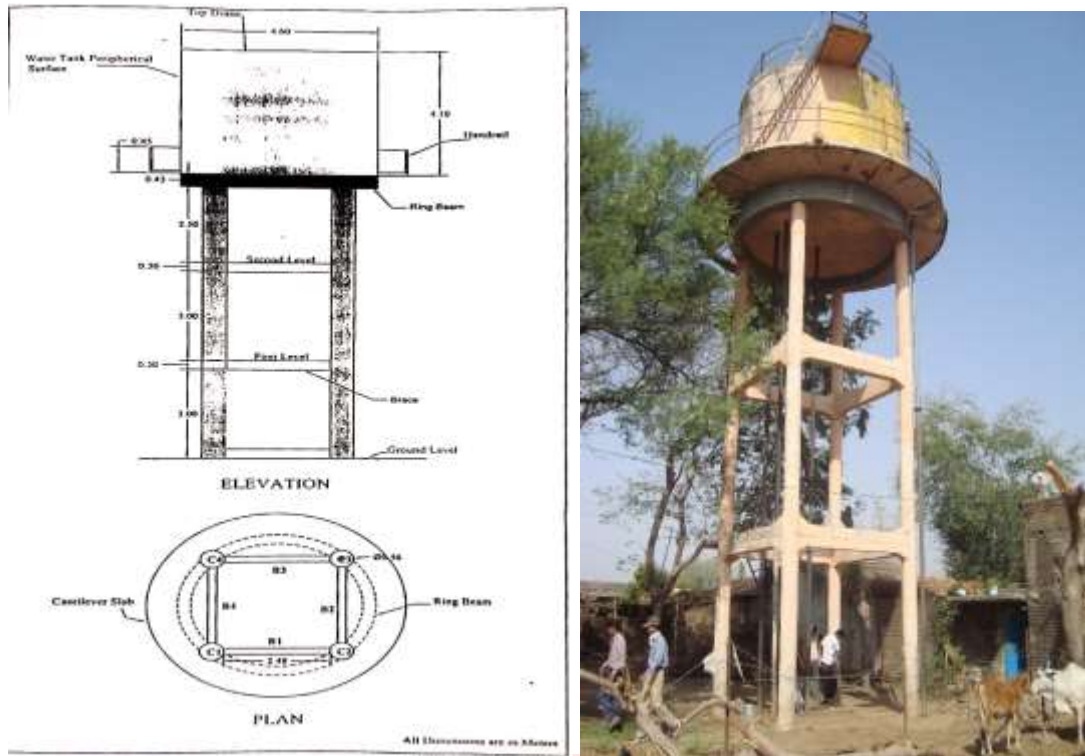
Plan elevation and dimensional details of RCC ESR at Nimbhi
